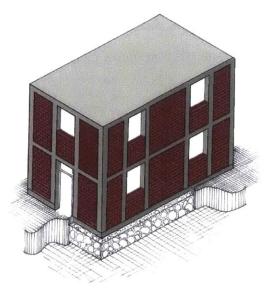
Sketch of a two-story confined masonry building from Brzev (2007).
